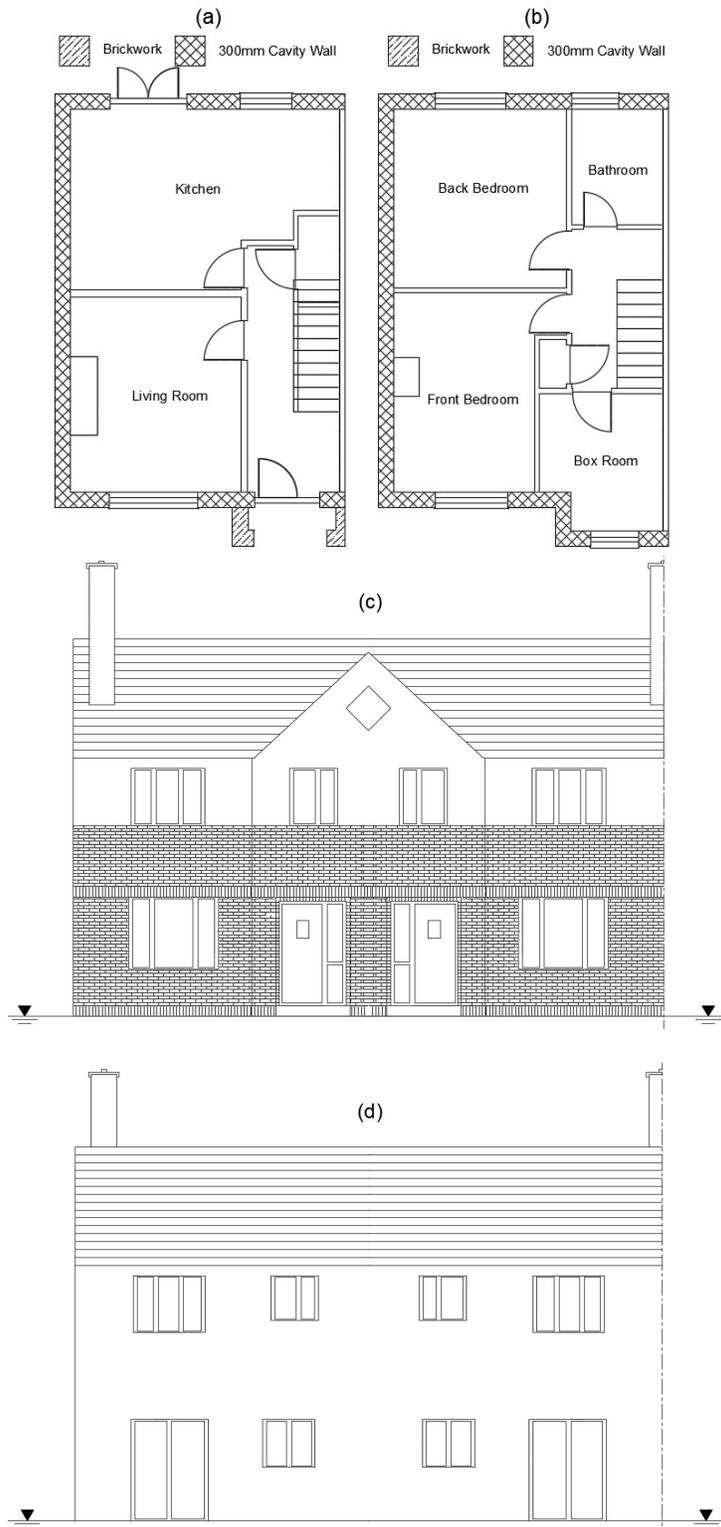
(a) Ground floor layout, (b) First floor layout, (c) Front façade and (d) Back façade of the 2000 mid- and end-terrace case study building.
